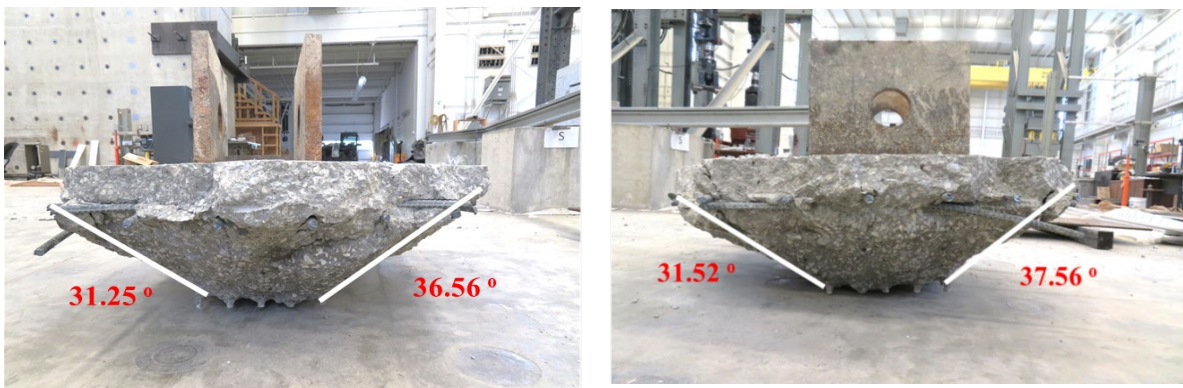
Breakout cone with an average angle of 34.22 degrees
